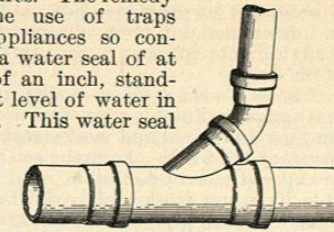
Method of Connecting Soil Pipe with House Drain.
